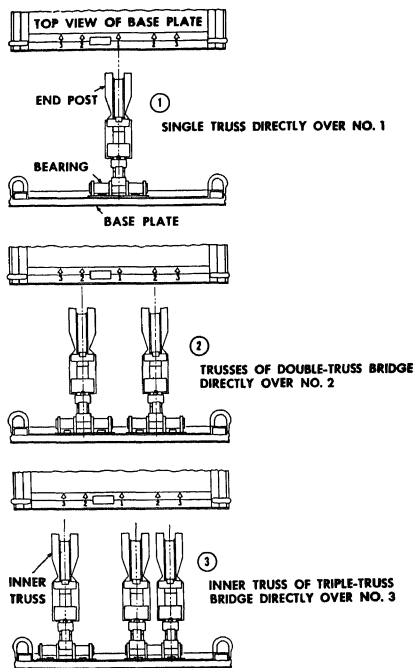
Use of base plate and bearings under single-, double-, and triple-truss bridges.
